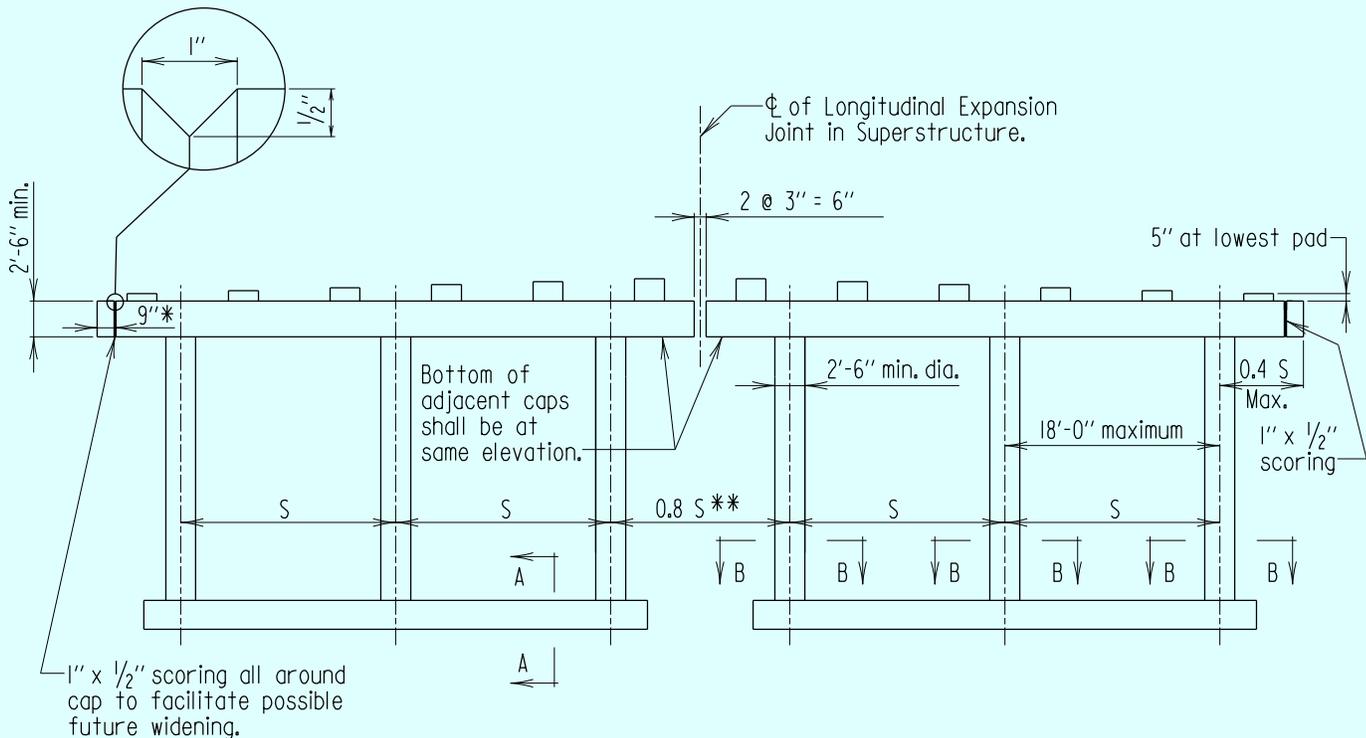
DETAIL NO. SUB-PR-101 SHEET 2 OF 4
